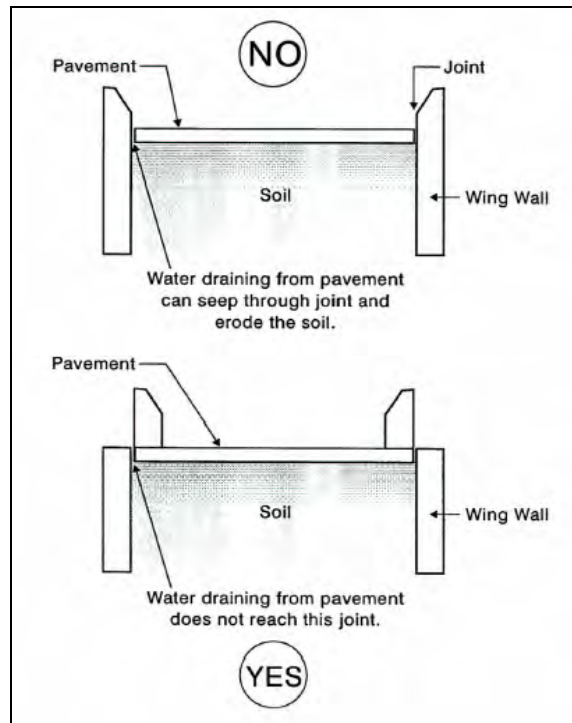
Cross-section showing wingwall and drainage detail (Taken from NCHRP Synthesis: 234, 1997)
